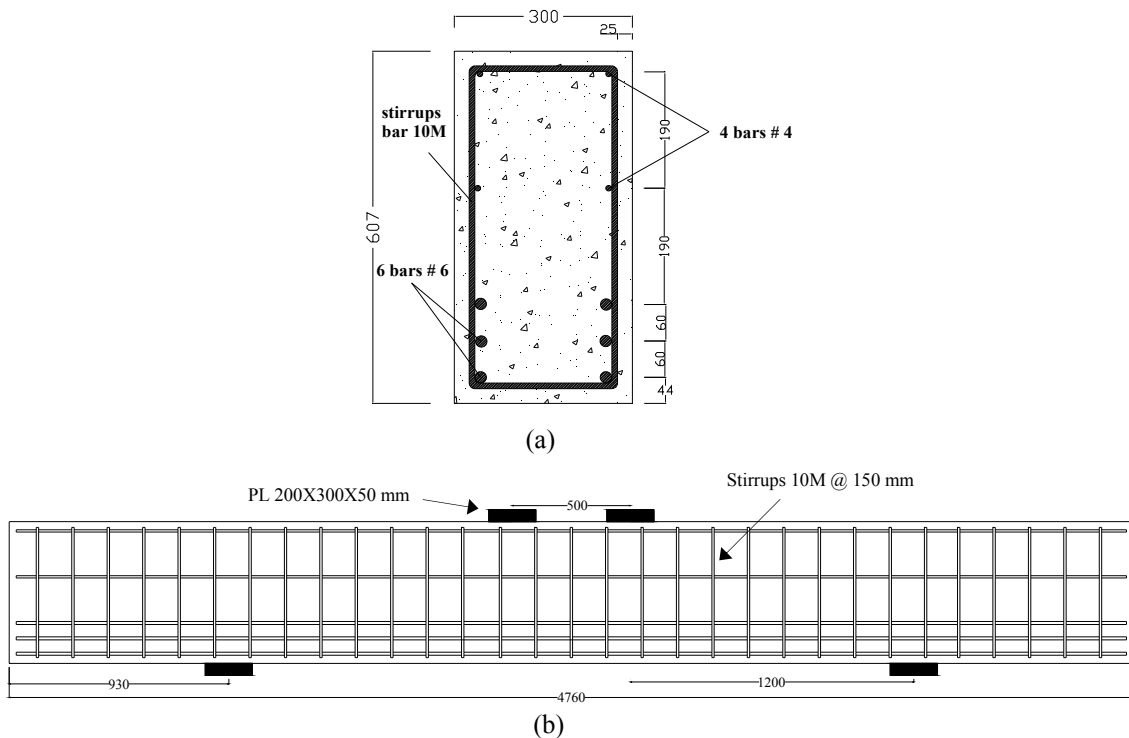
Beam MS3-2: (a) Cross section (b) Elevation
